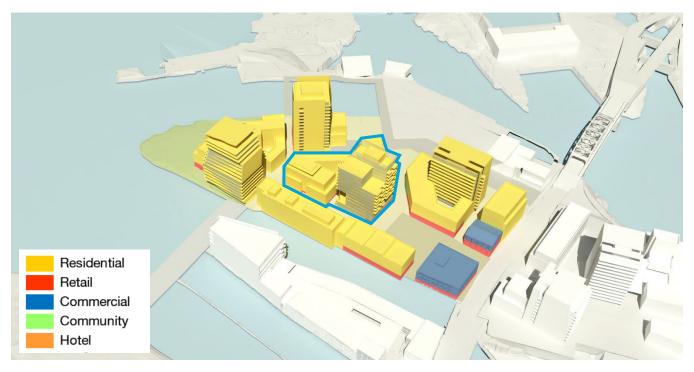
Chaudière West District, Domtar Lands Master Plan, Block 204 outlined in blue
